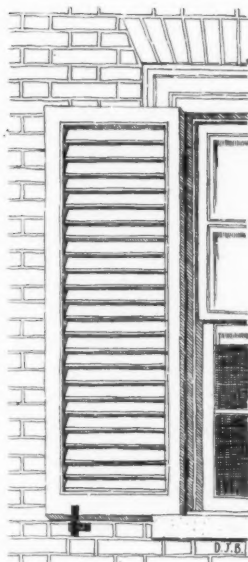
BARTLETT HOUSE, NEWBURYPORT, MASS. BUILT 1812
